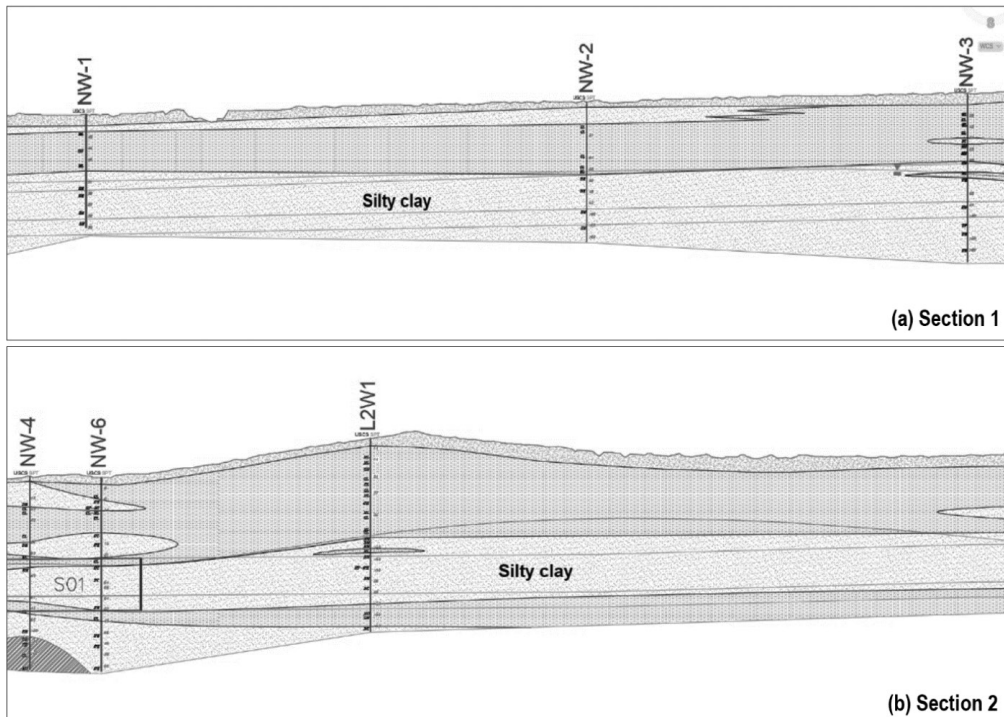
Soil profile: (a) Section 1 and (b) Section 2.
